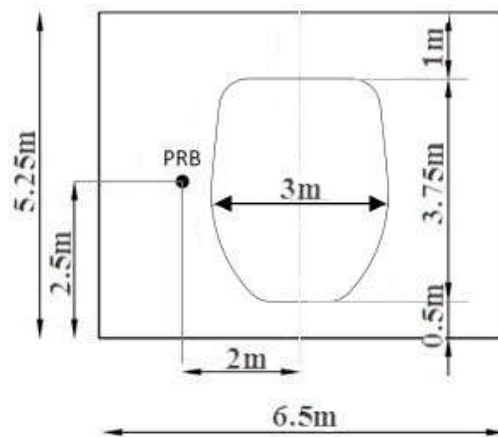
Cross-sectional dimensions of the model developed in SOLIDWORKS software
